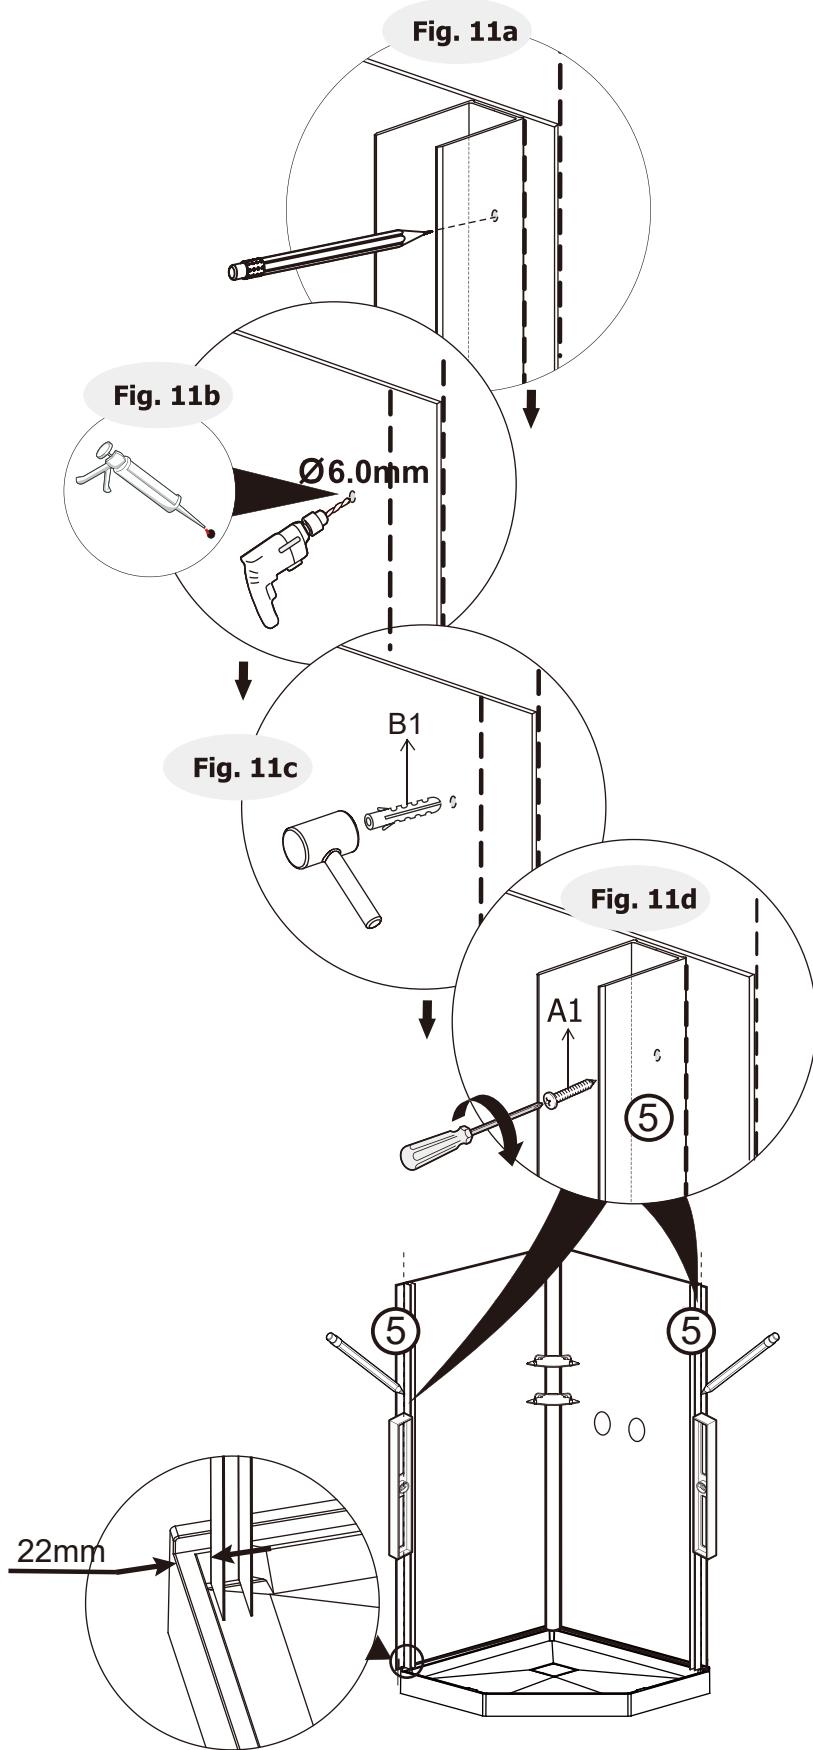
Position and level both wall jambs at 3/4" from the outside edge of the shower base and mark the fastening holes.
